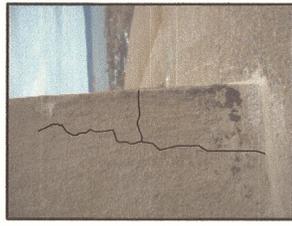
SURFACE CRACK (± 0.610 LM)
